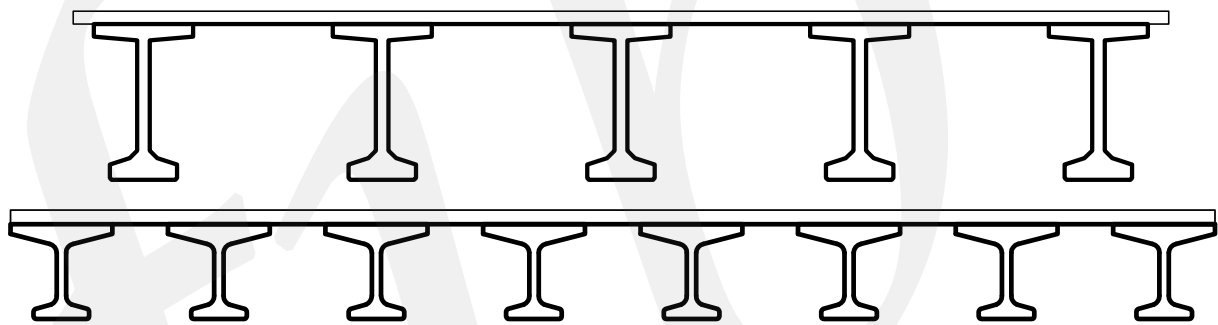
Common I-girder and double-tee girder cross sections – Types C and D.
